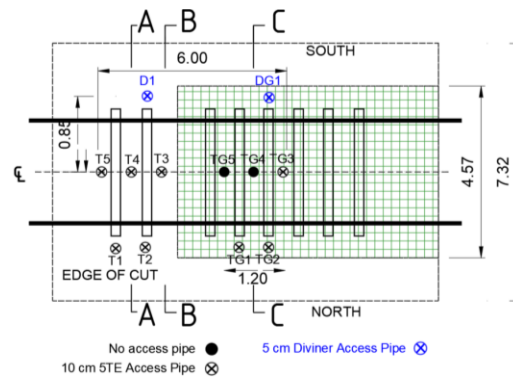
Plan view layout of the access pipe installation (dimensions in meters).
